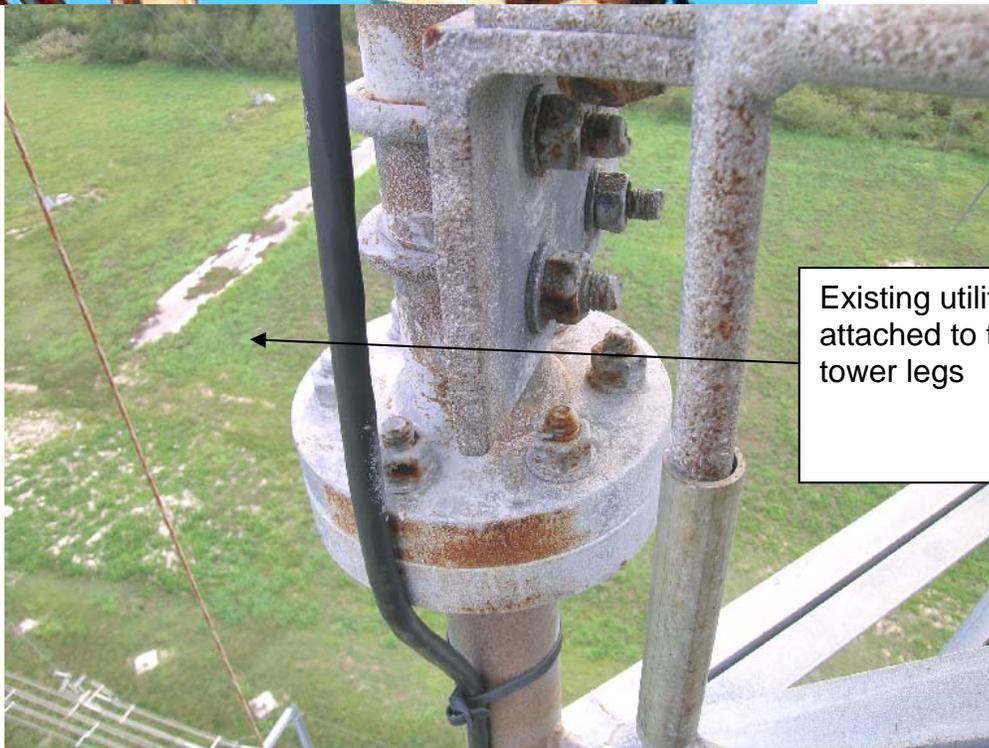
, Existing Utility Lines Attached to the Tower Legs, Tinian Site
